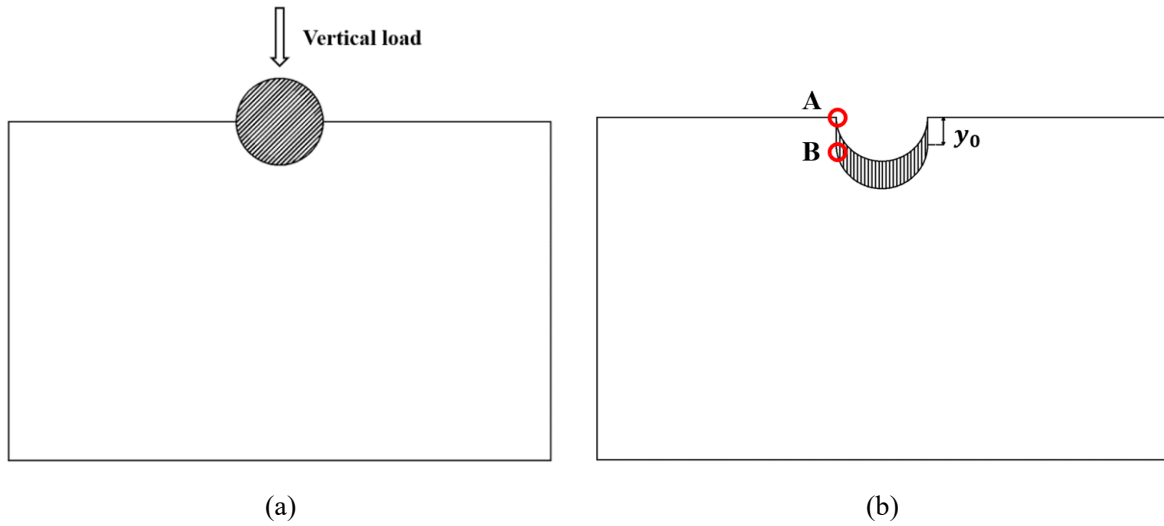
Vertical deformation of the Winkler concrete foundation (a) dowel bar under vertical load, (b) uniform deformation of concrete dowel slot.
